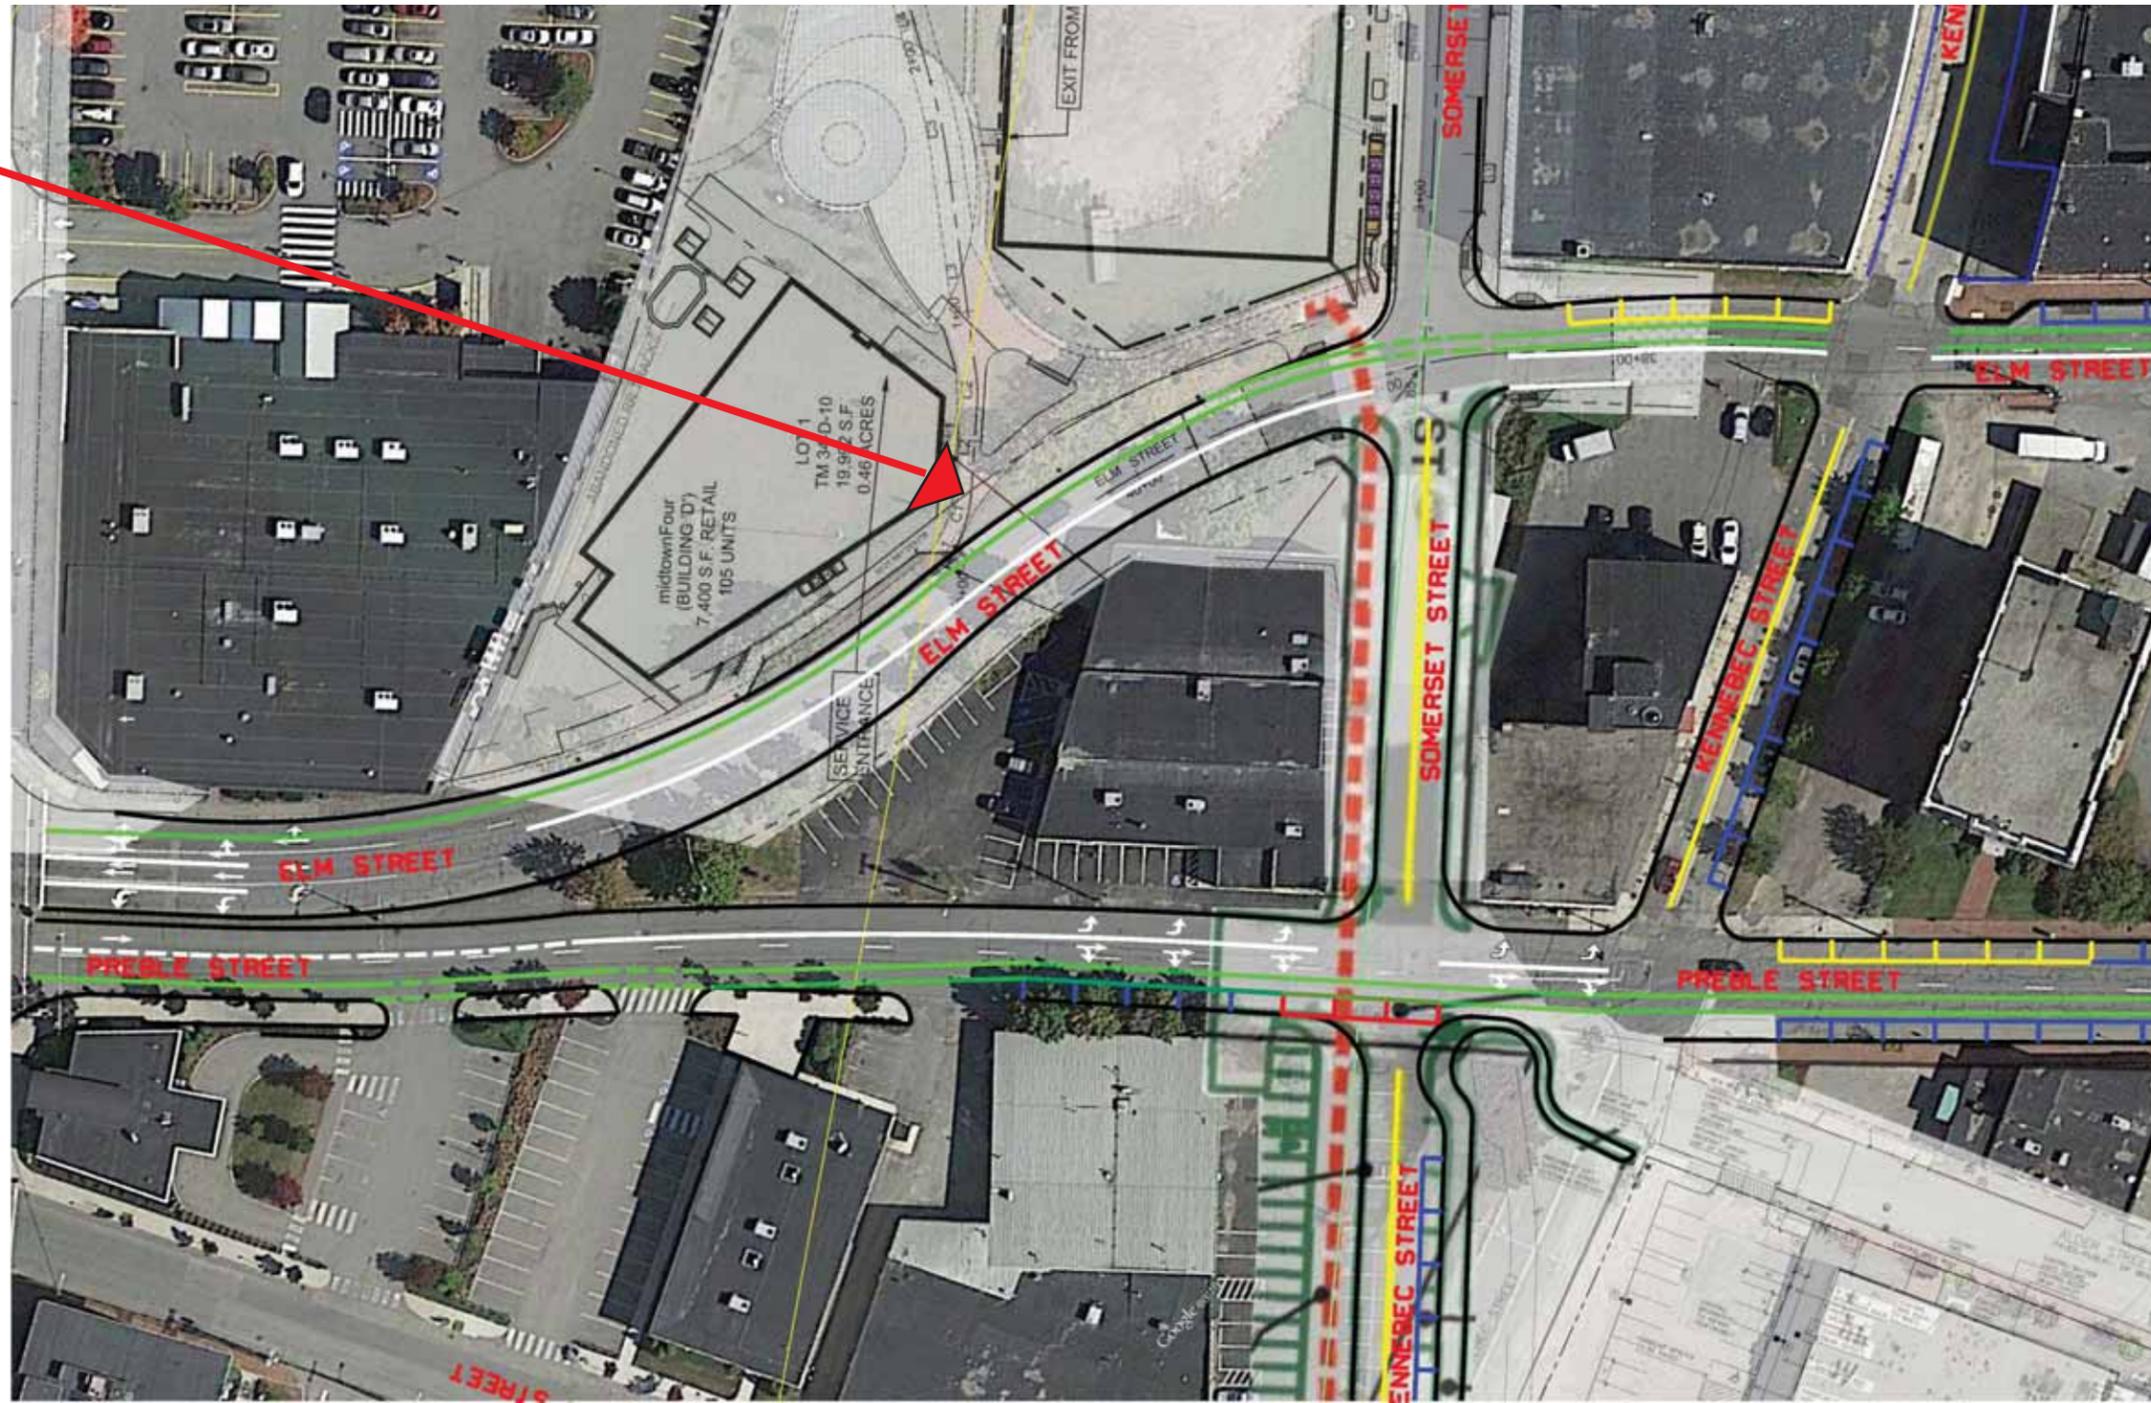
Section 3 of 3 – Preble and Elm Street - Long Term
